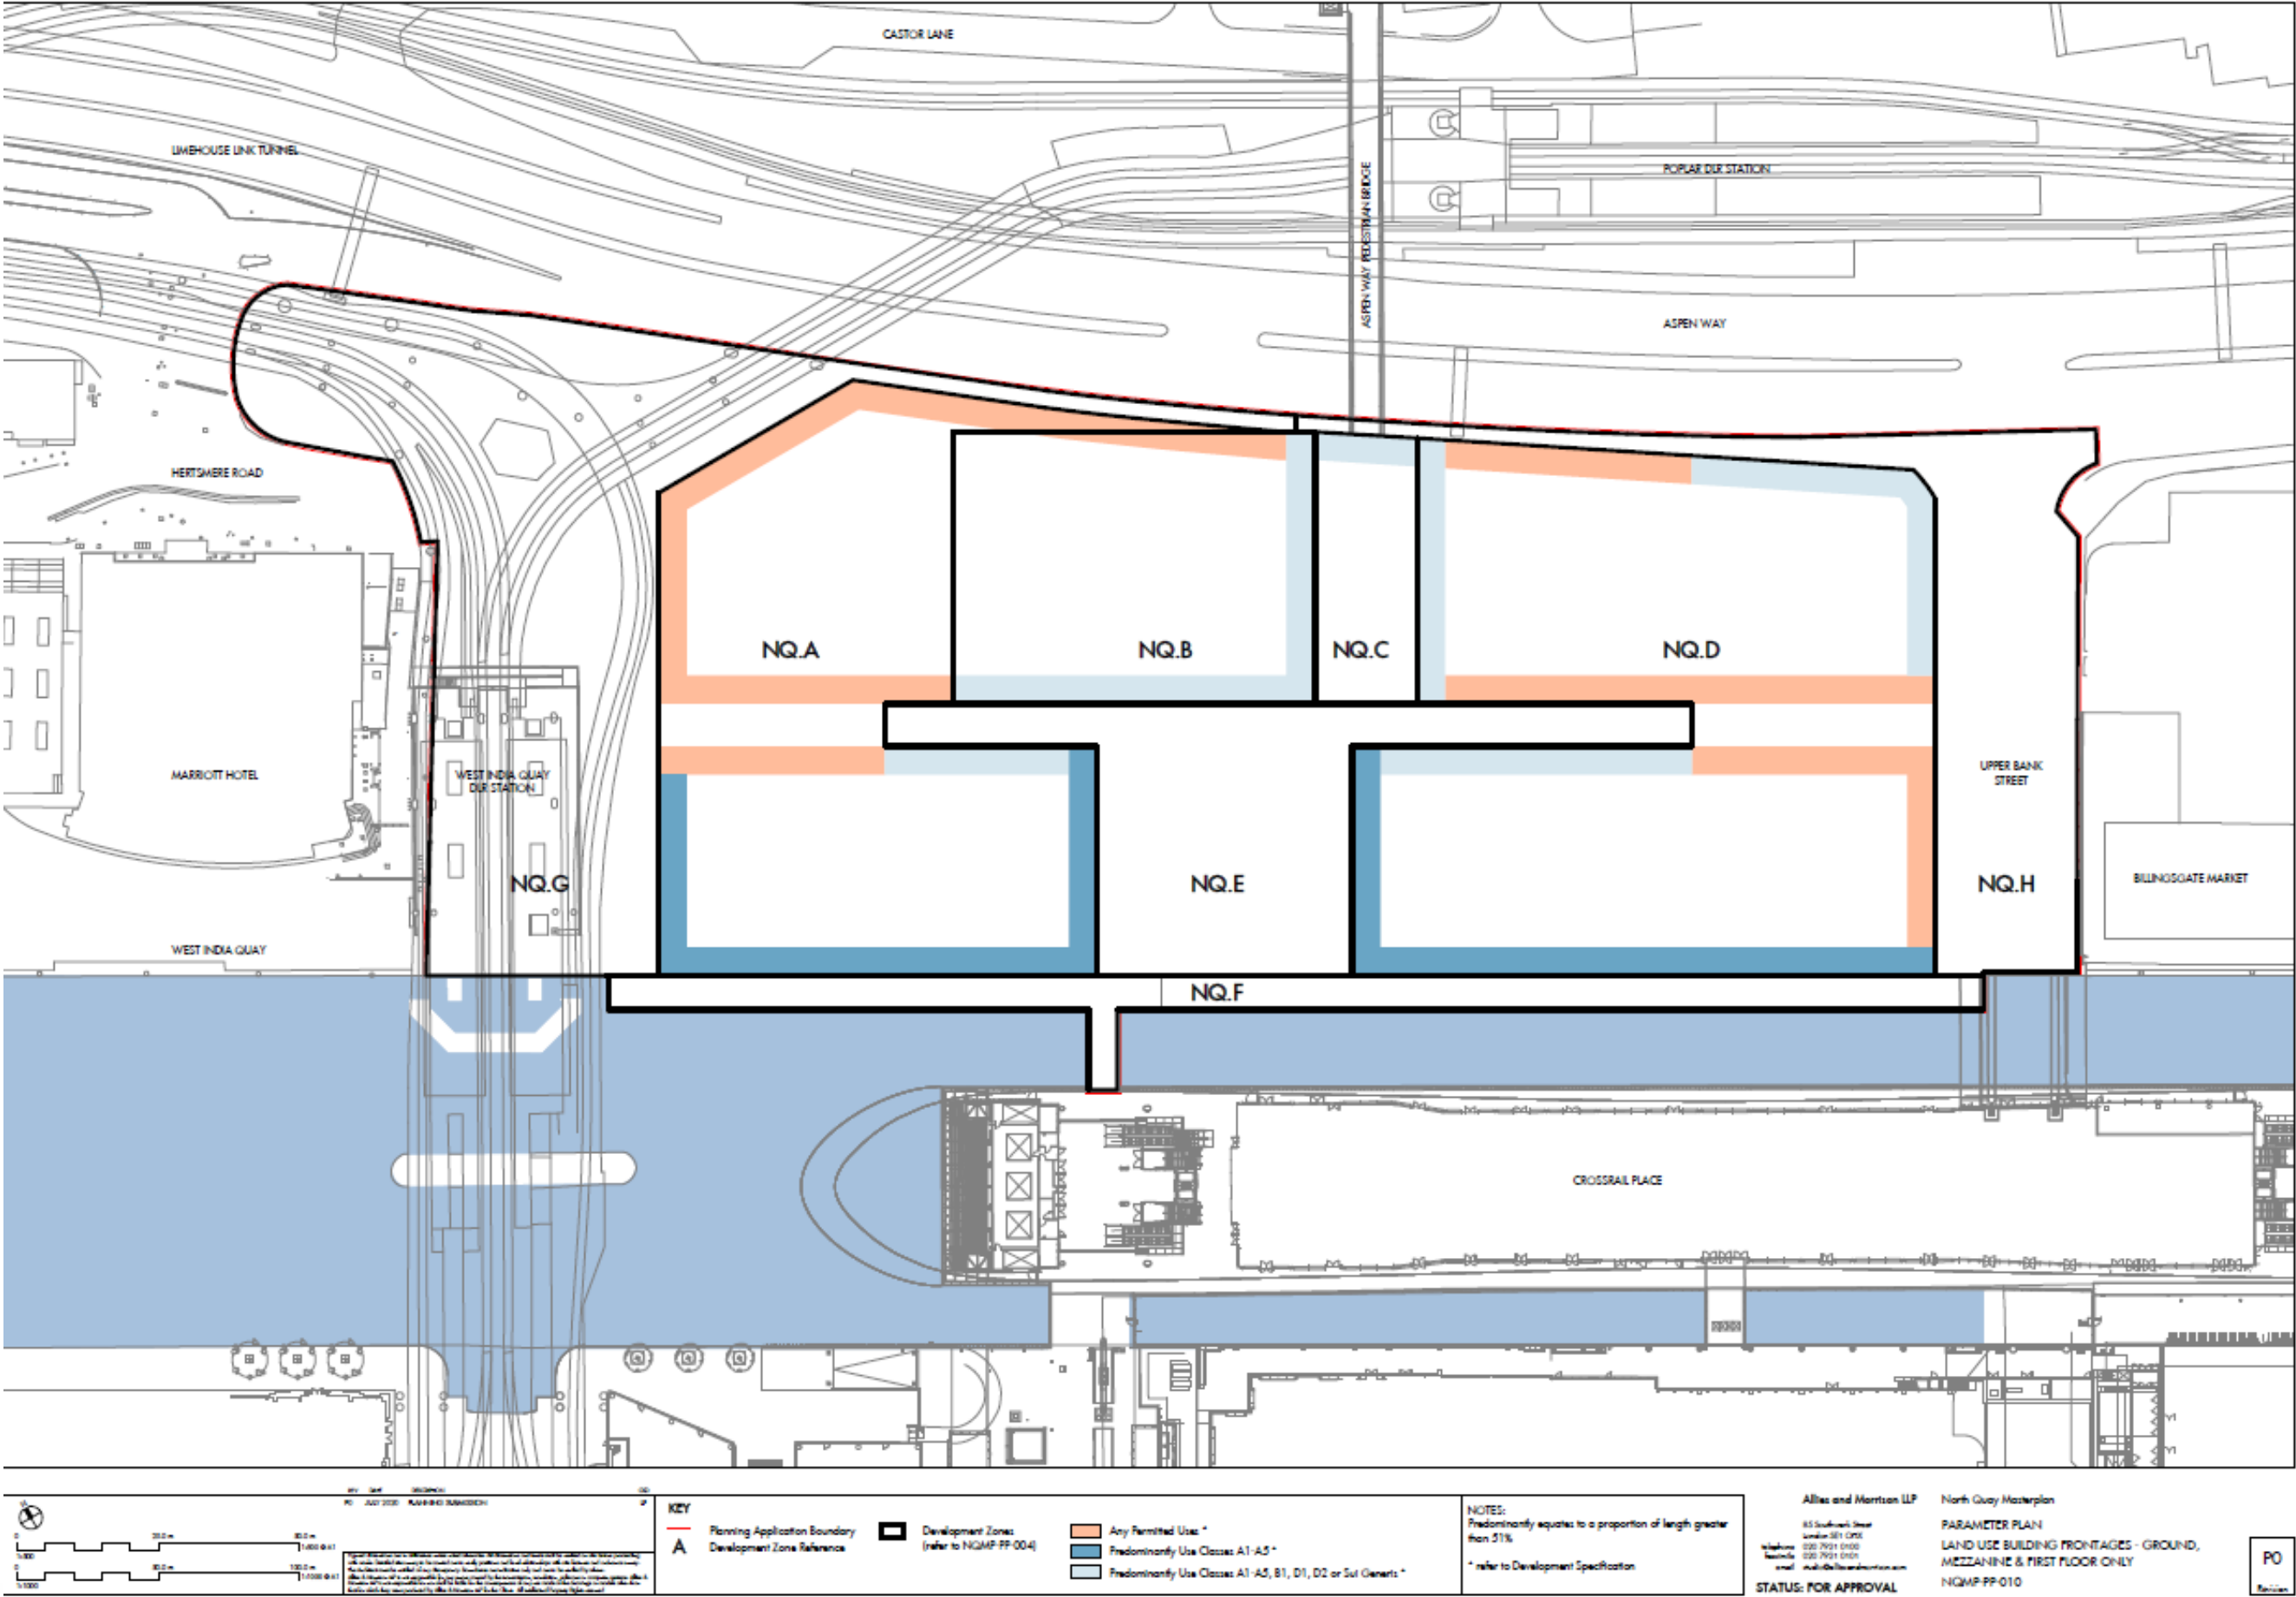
NQMP-PP-010 – Land Use Building Frontages – Ground, Mezzanine and First Floor
